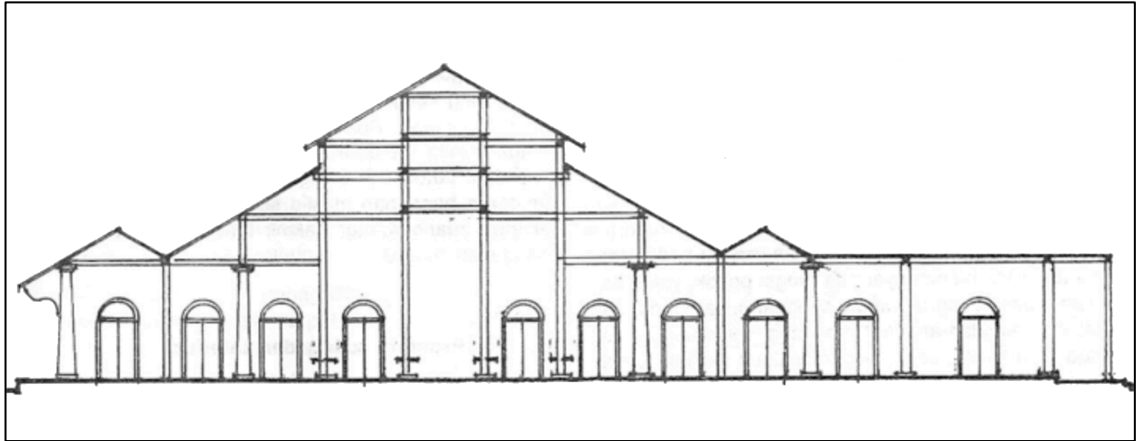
Masjid Sunan Ampel longitudinal cross-section drawing
